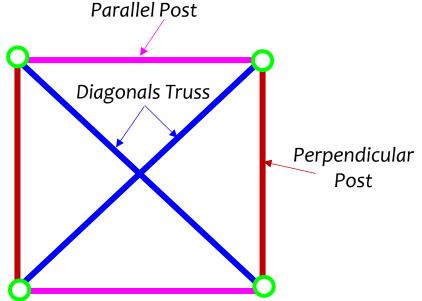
Schematic Description of Modeling of Concrete Slab Floor Diaphragm (Taking BT Model for Example)
